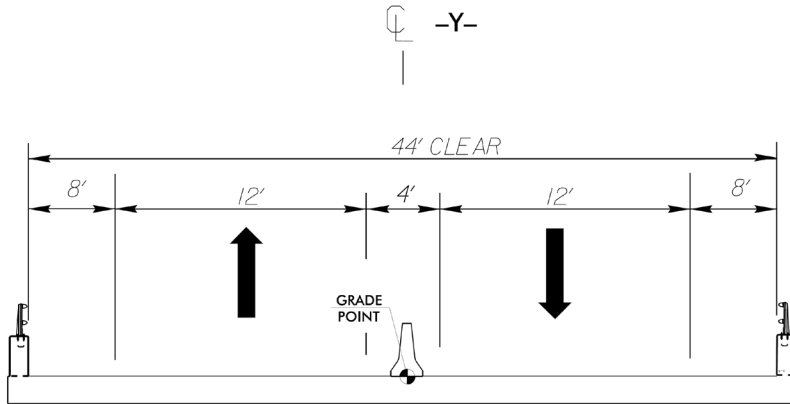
Proposed Bridge Typical Section (DSA 2)
